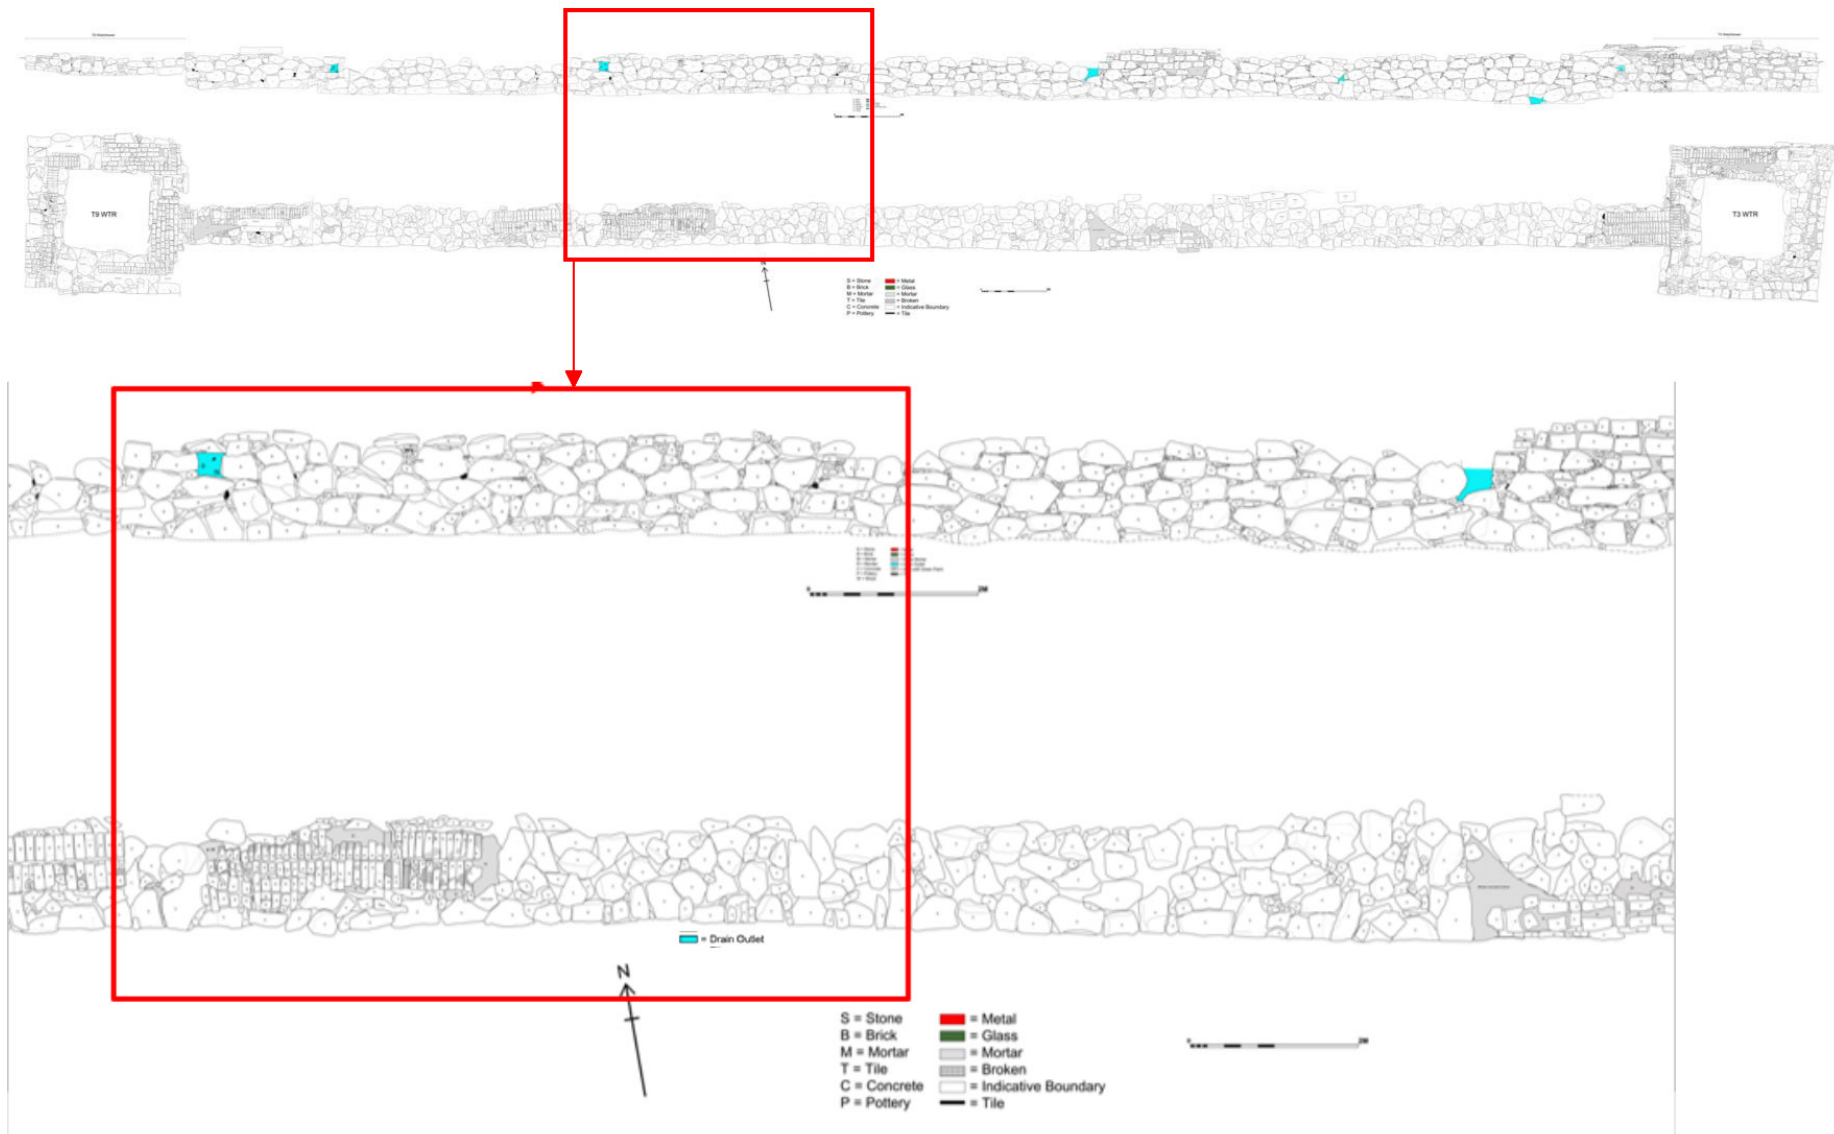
Position of the to be relocated area within the entire southern wall foundation remains and section and ground plan of the proposed relocation section.
